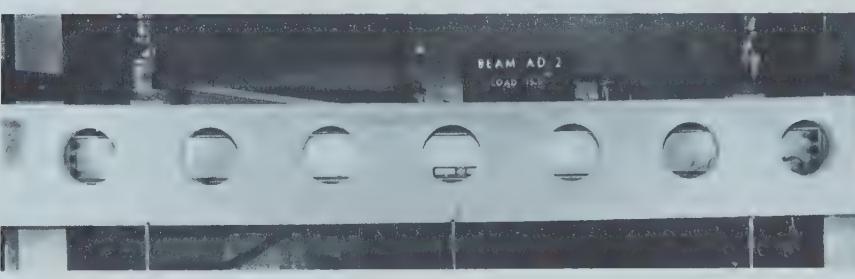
BEAM AD-2 CRACKING AND FAILURE PATTERNS
